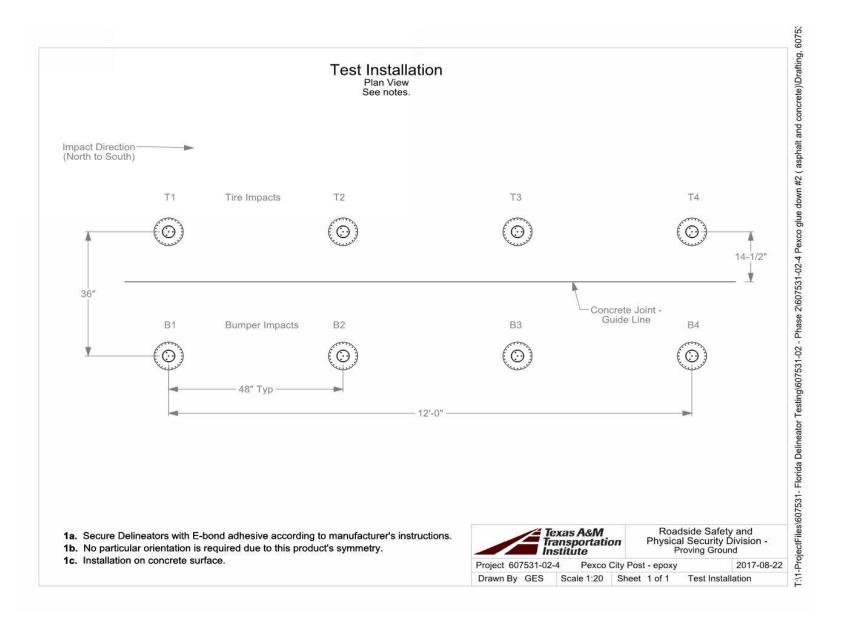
607531-02-4 Test Setup Details on Concrete Surface.
